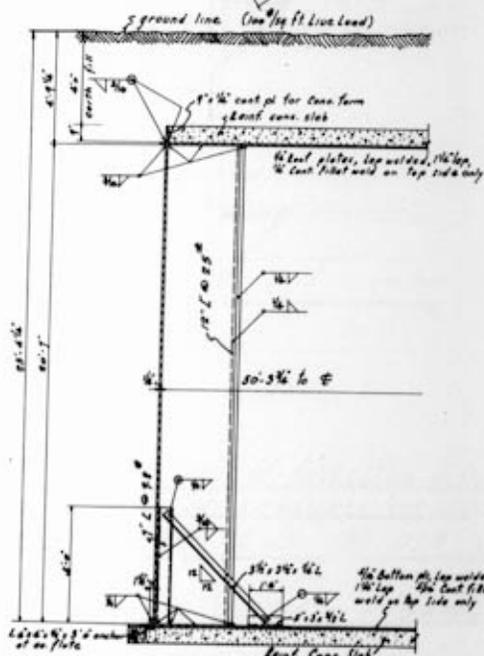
ELEVATION OF SCALLOP TYPE TANK SHELL
